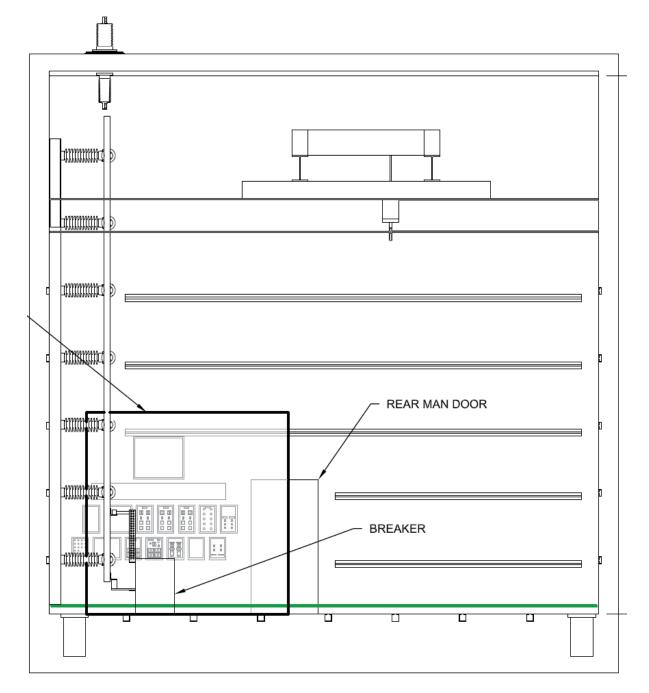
Elevation view of Test Cell #9. Breaker shown in drawing is part of KEMA protection system and is not the open box.
